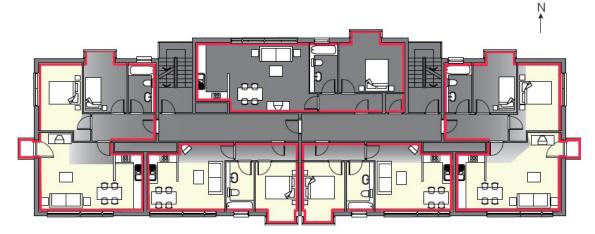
Careful layout design means that four out of the five flats shown have a south-facing living room
